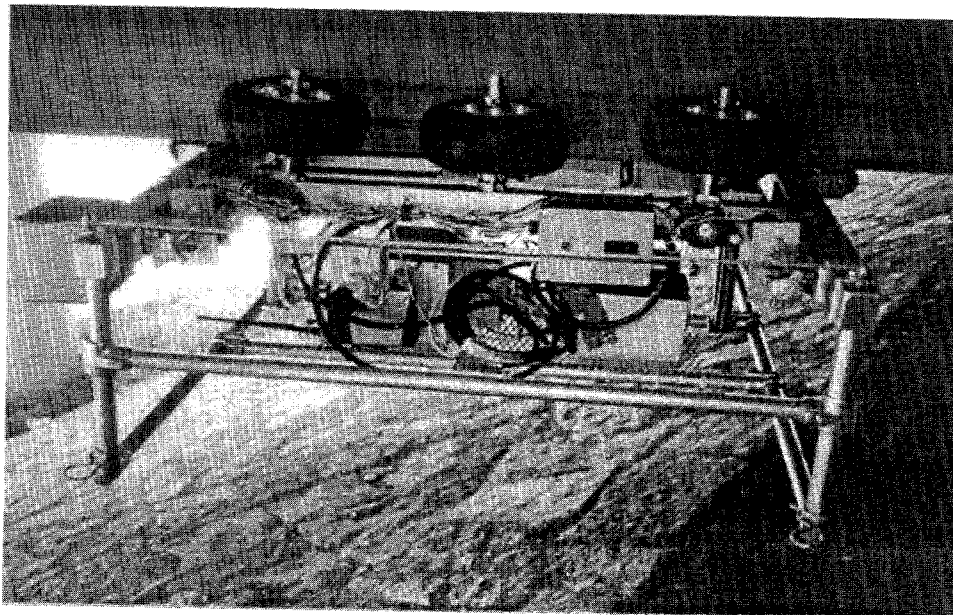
Close-up view of the beam-rider unit on a concrete girder.
